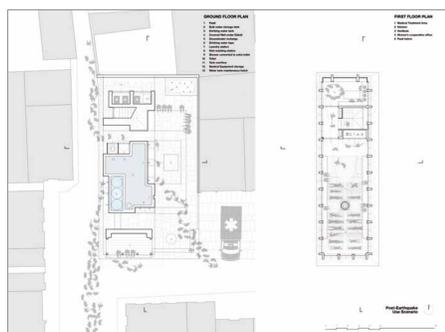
Post-disaster use of the diverse spaces in the project, ground floor and first floor.
